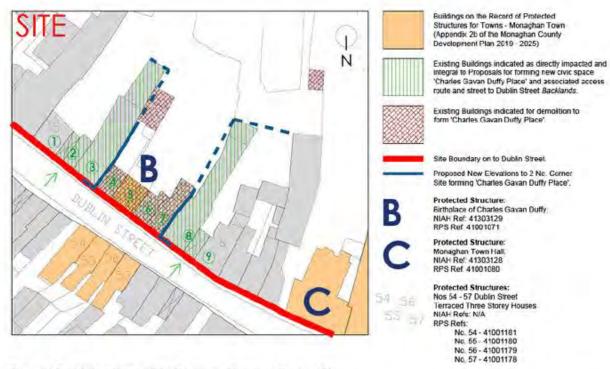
Existing Plan - Site Review. Consarc Design Group.
